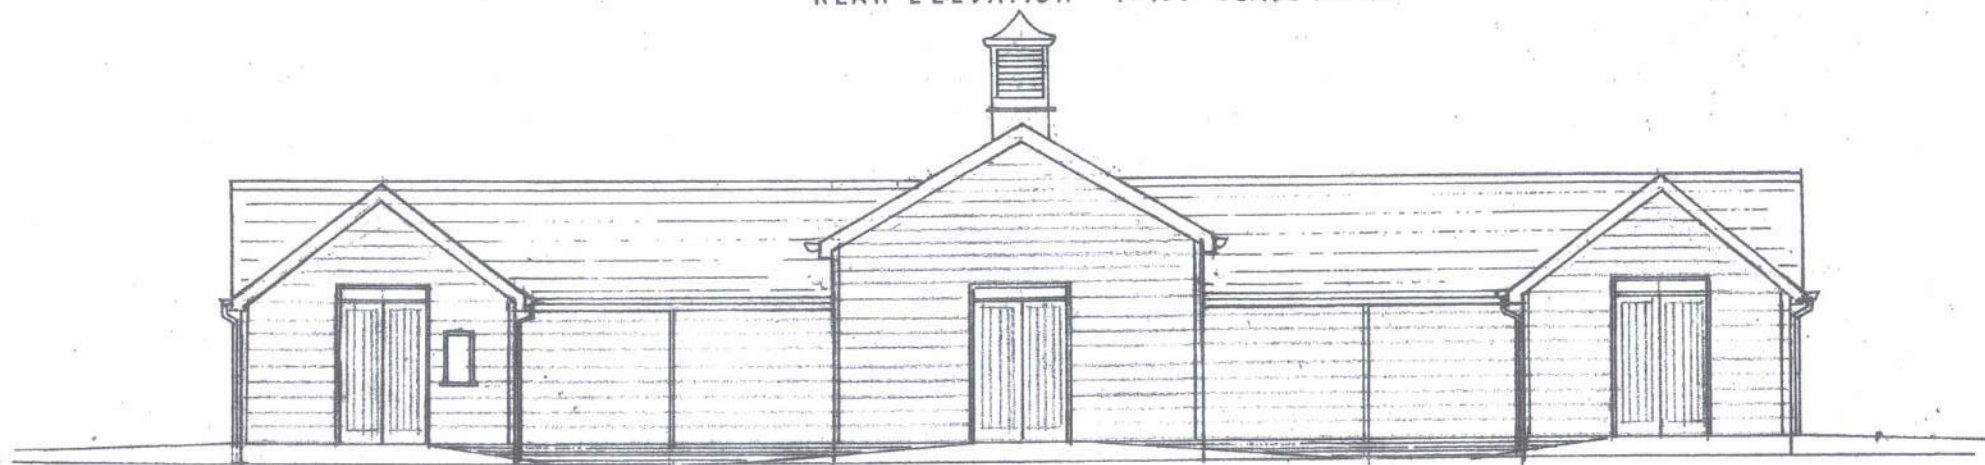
DETAIL OF STABLES WITH ANCILLARY FACILITIES.
